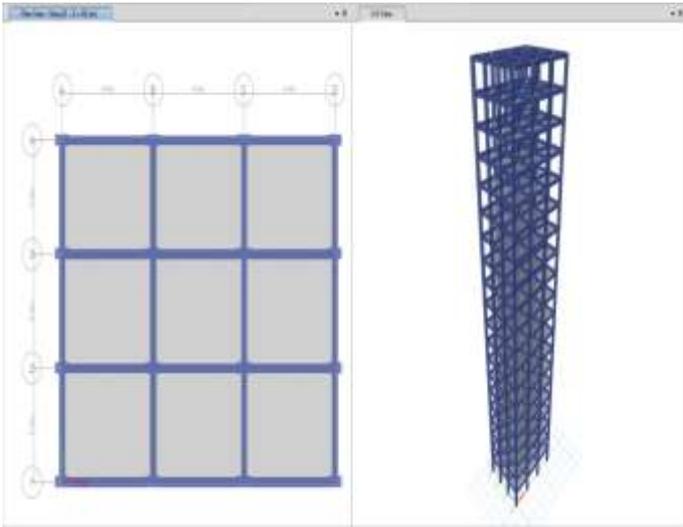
Plan And 3d View of Structure Of 20 Storey In ETABS
